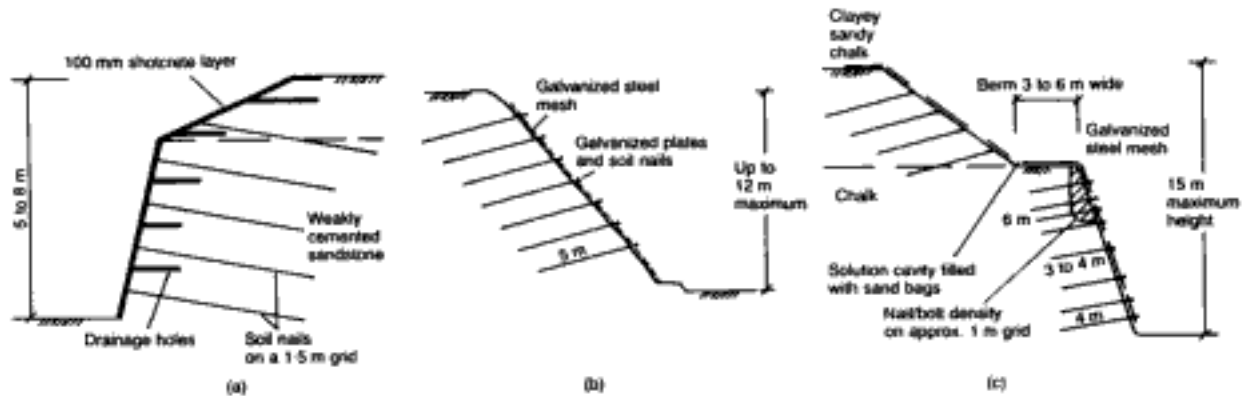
Cross-sections of typical nailed slopes in the UK: (a) temporary soil-nailed slope; (b) soil-nailed slope; (c) rock-bolted and soil-nailed slopes (Barley⁷)
